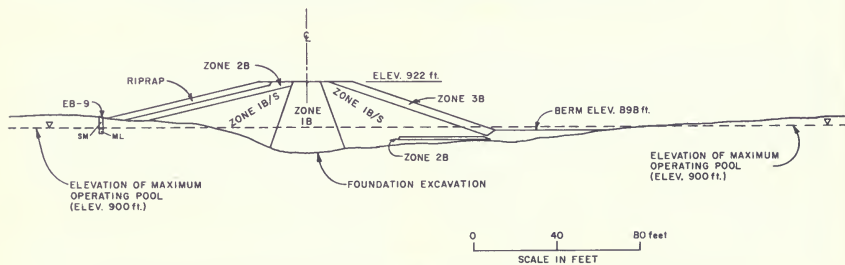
Cross Section AA of Bidwell Canyon Saddle Dam Along West Dam Shear Zone (see Figure 449)
